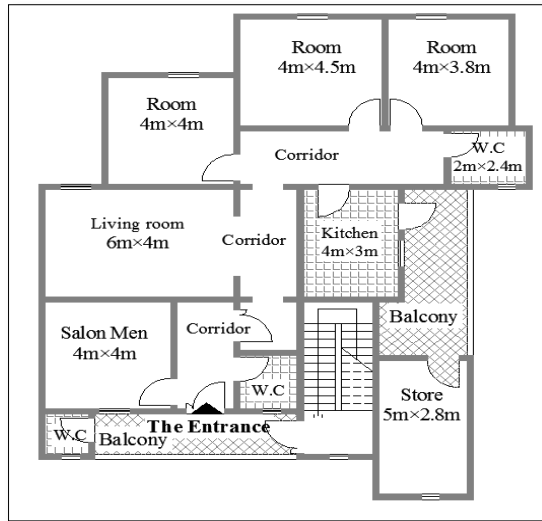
Ground floor plan of Hussein Mohamed house in Ghadames.
